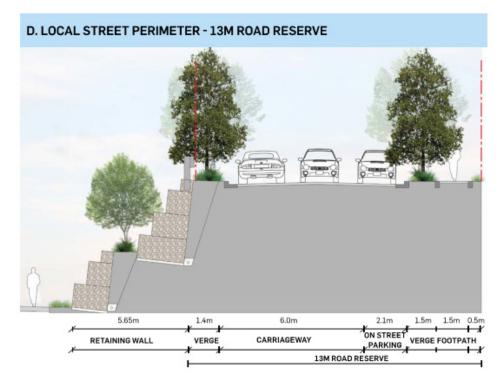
D - Local Street Perimeter - 13m Road Reserve
